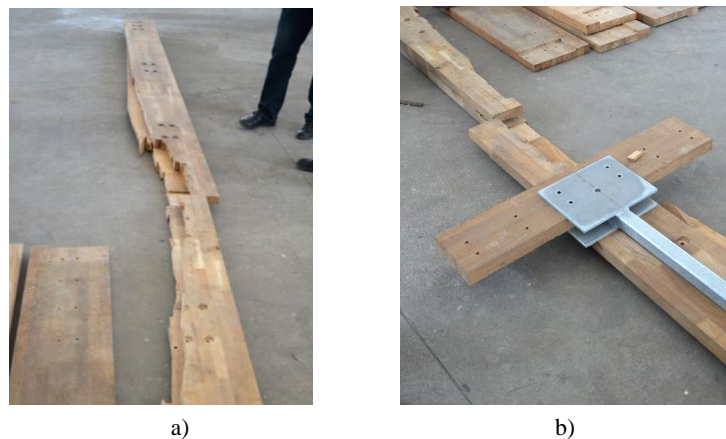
Two sections of the beam reconstructed after the failure: a) view with the elements on the ground; b) connecting device with the post, two gusset plates, and timber link element.
